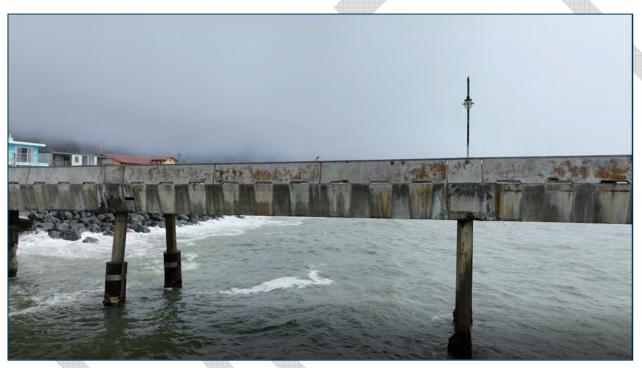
Deck Exterior from Bent 1B to Bent 1C - North Face
